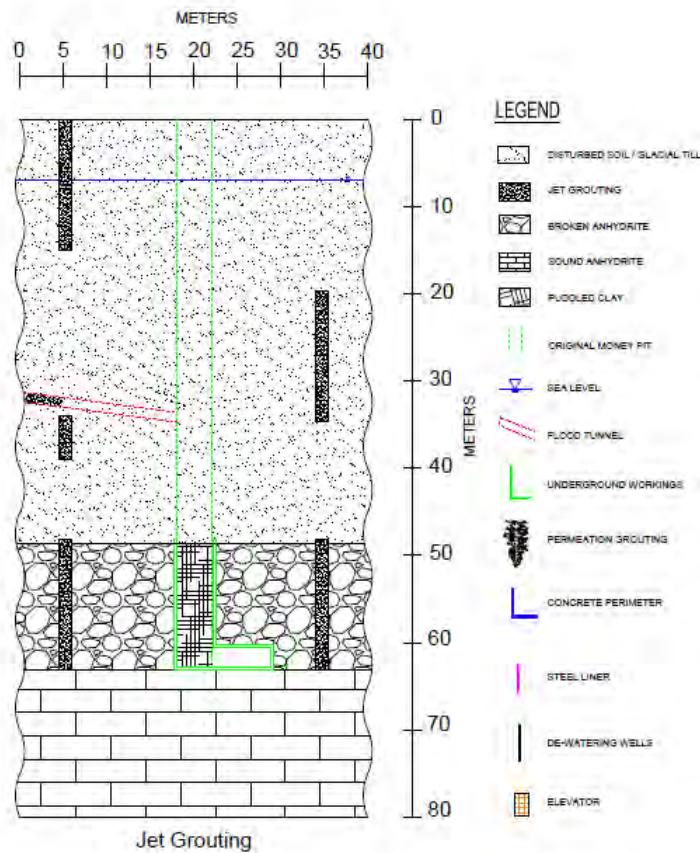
Cross-section of the jet grouting profile in the broken anhydrite and intermittently through the glacial till layers
